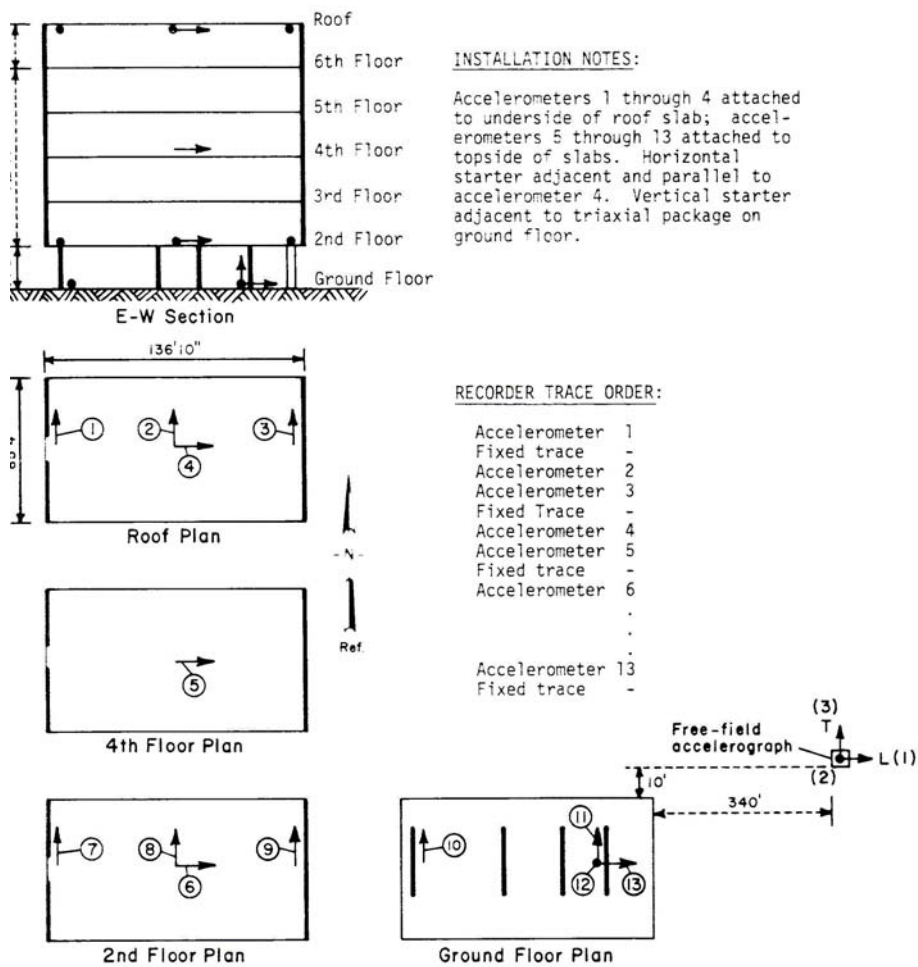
Sketch and sensor layout for Imperial County Services Building (from McJunkin and Ragsdale 1980)
